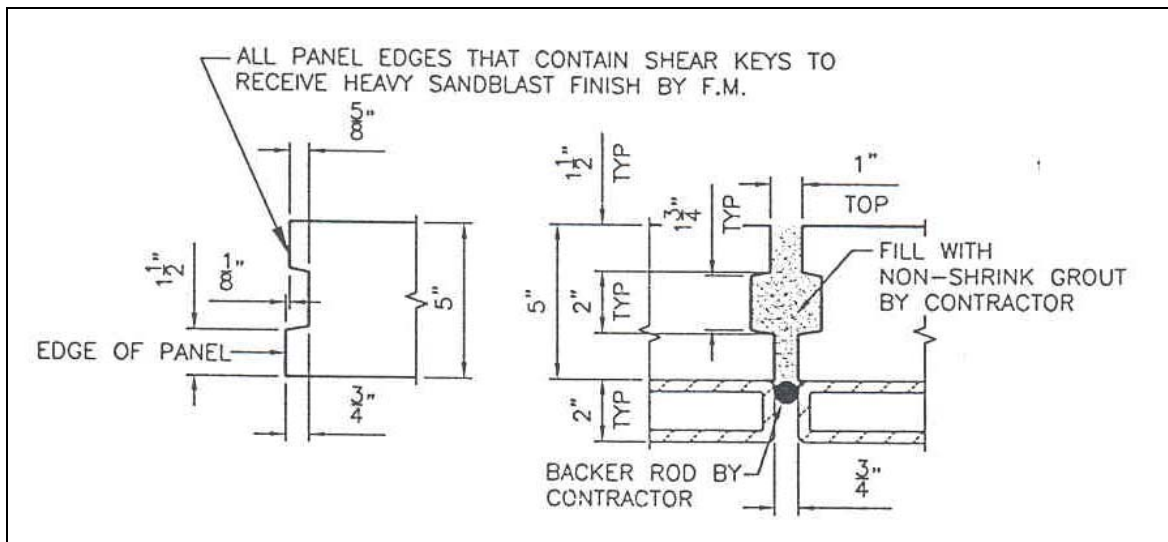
Typical shear key detail for bridge over Little River Town, Stowe, VT (The Fort Miller Co., Inc., 2000)
